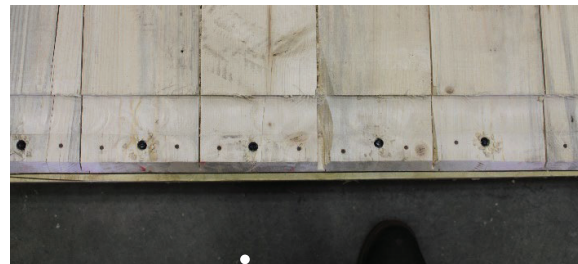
Distributed anchorage (Specimens 2, 3 and 4).
